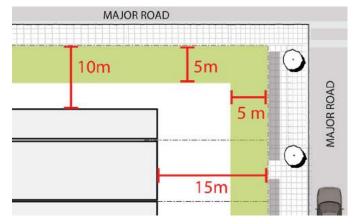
On corner lots where walls are facing a major road there should be a 10m (minimum) setback.
